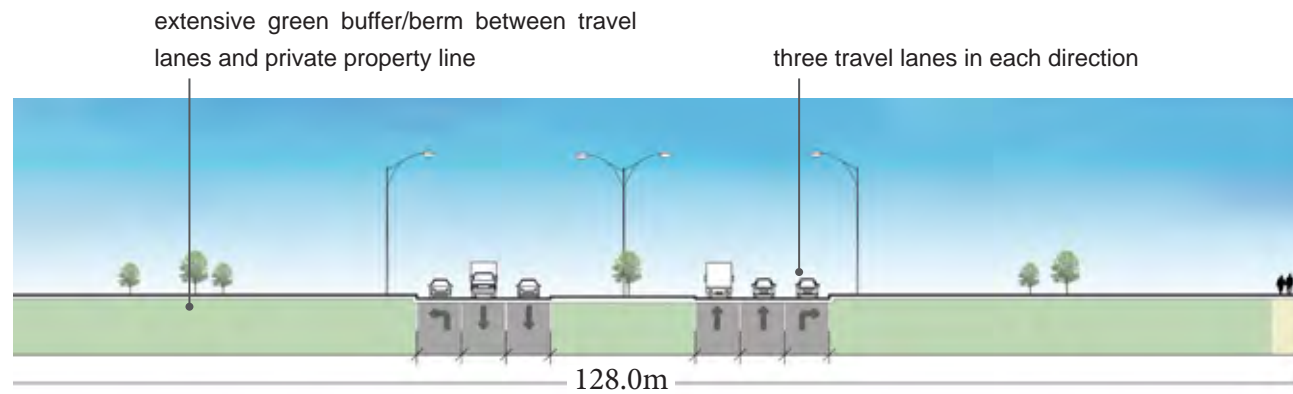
Existing Street Design of 22nd Street Adjacent to Confederation Suburban Centre
